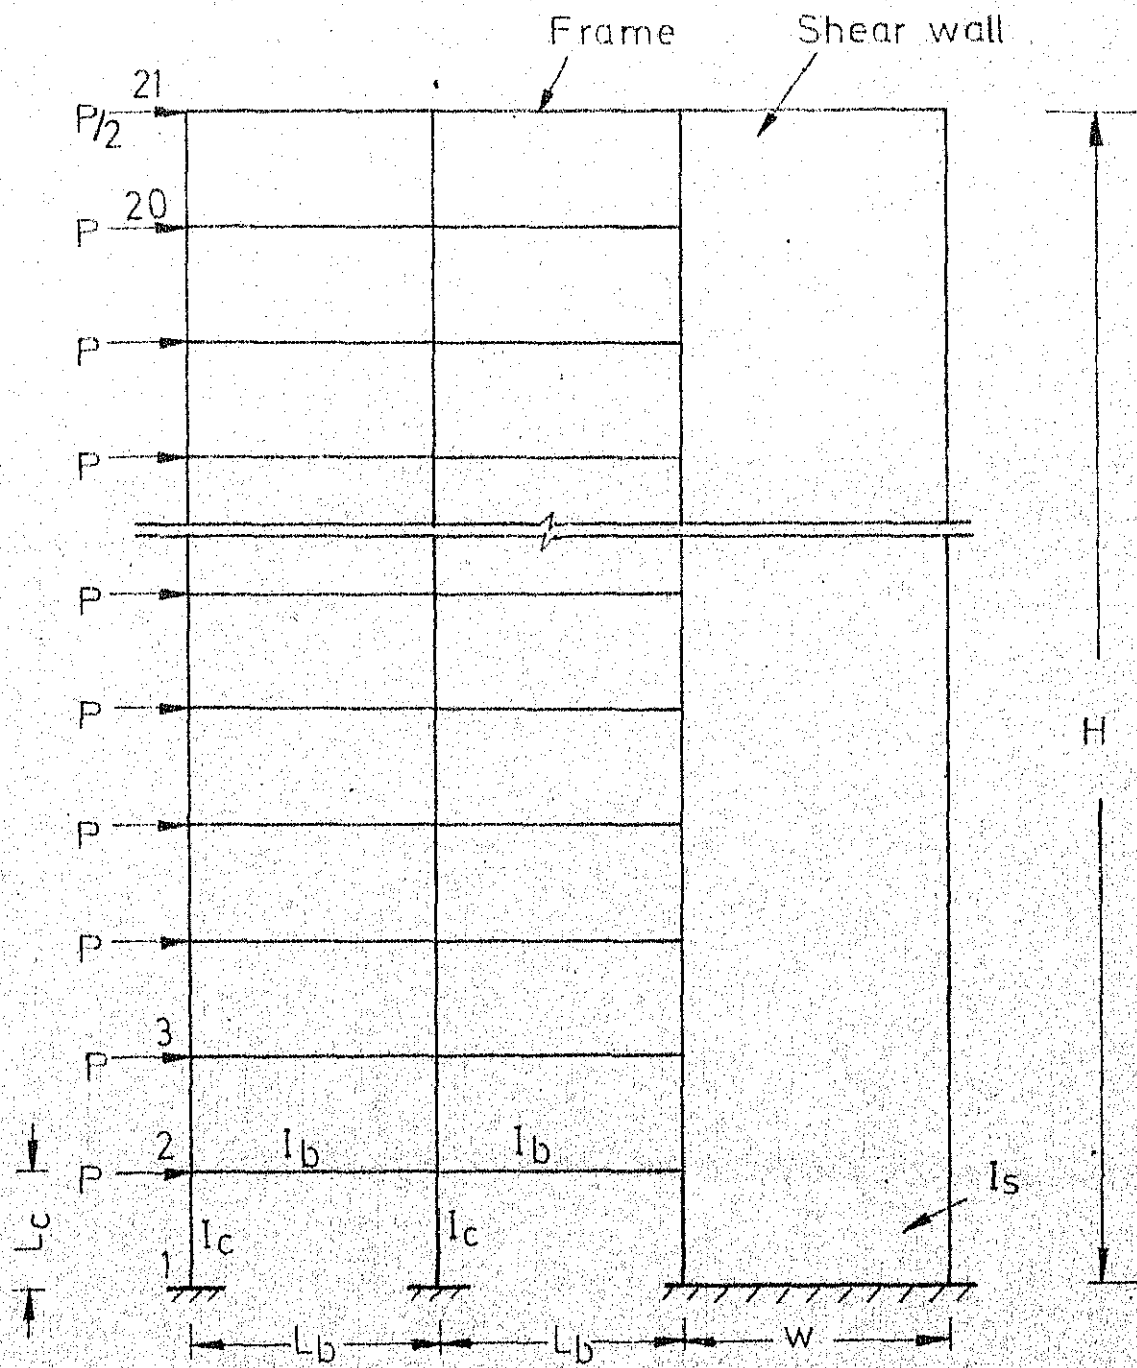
20 STOREY SHEAR WALL FRAME STRUCTURE
